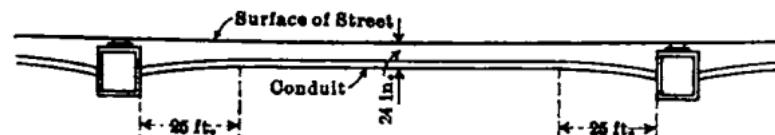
Section of underground conduit showing method of grading for drainage of ducts.
